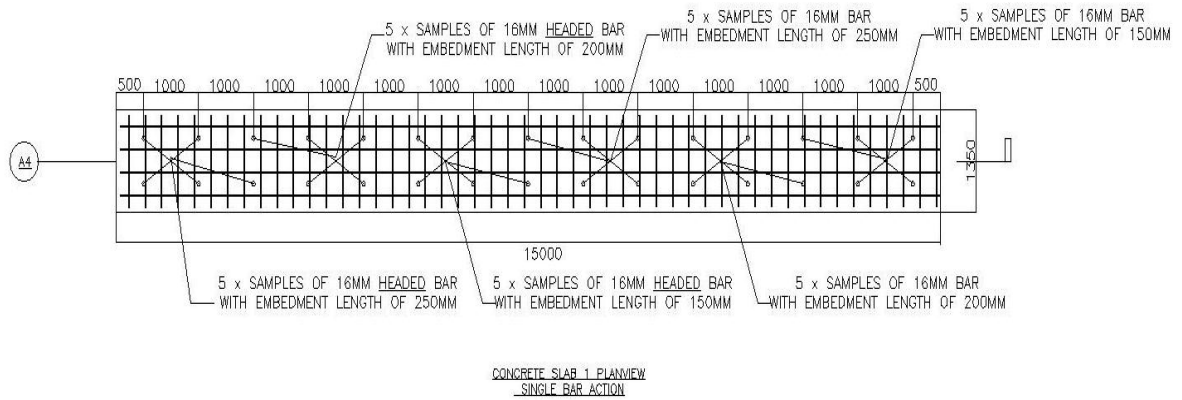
16M bar position in concrete slab, casted for pullout tests and dimensions of the casted slab.
